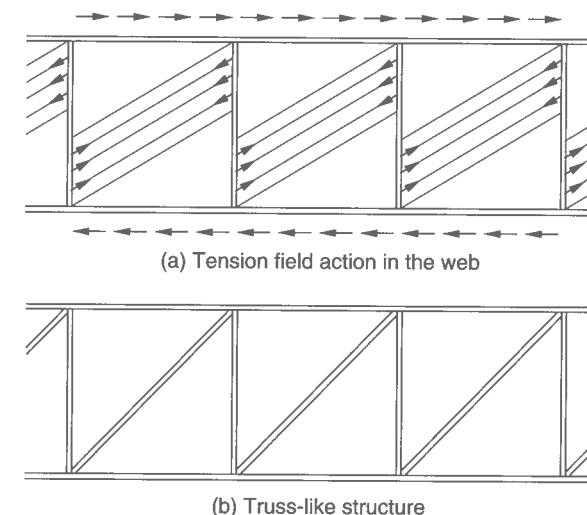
Tension field action in the web of a plate girder under shearing force
